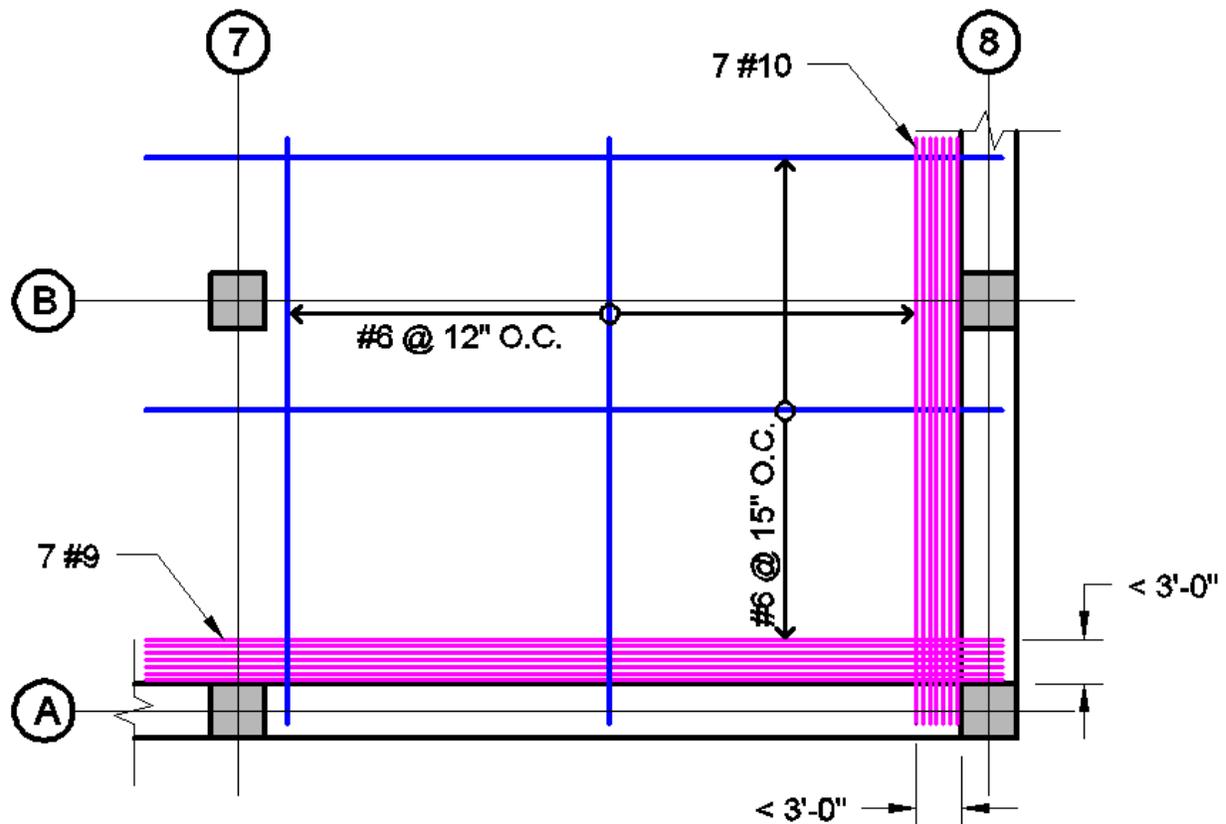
Typical Tie Force Bar Layout at Perimeter of Building
